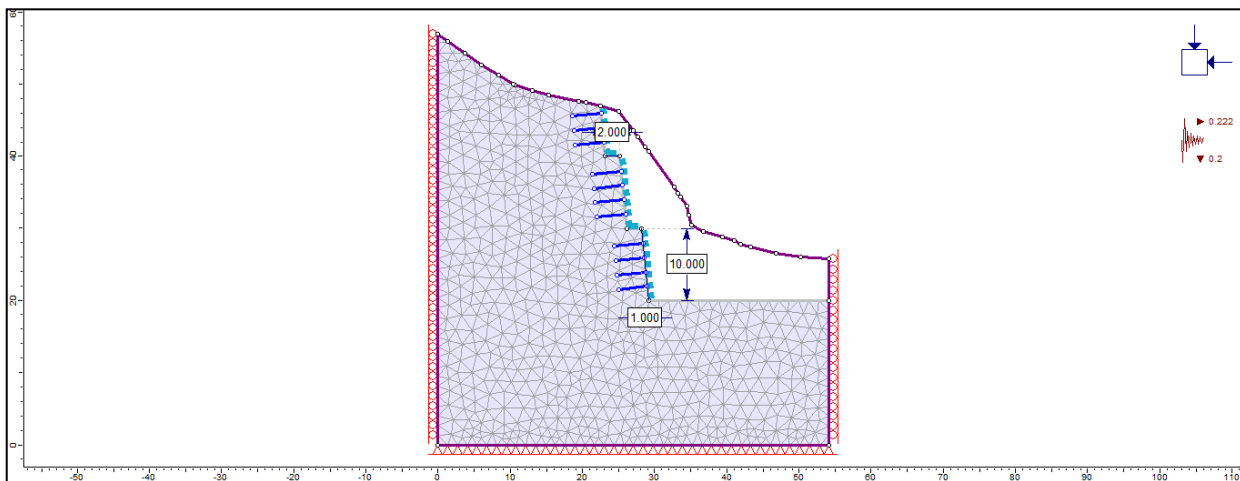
Excavated Slope of Main Access Tunnel Portal Modelled in Phase2 Software Generalized for Type B Service Tunnels
